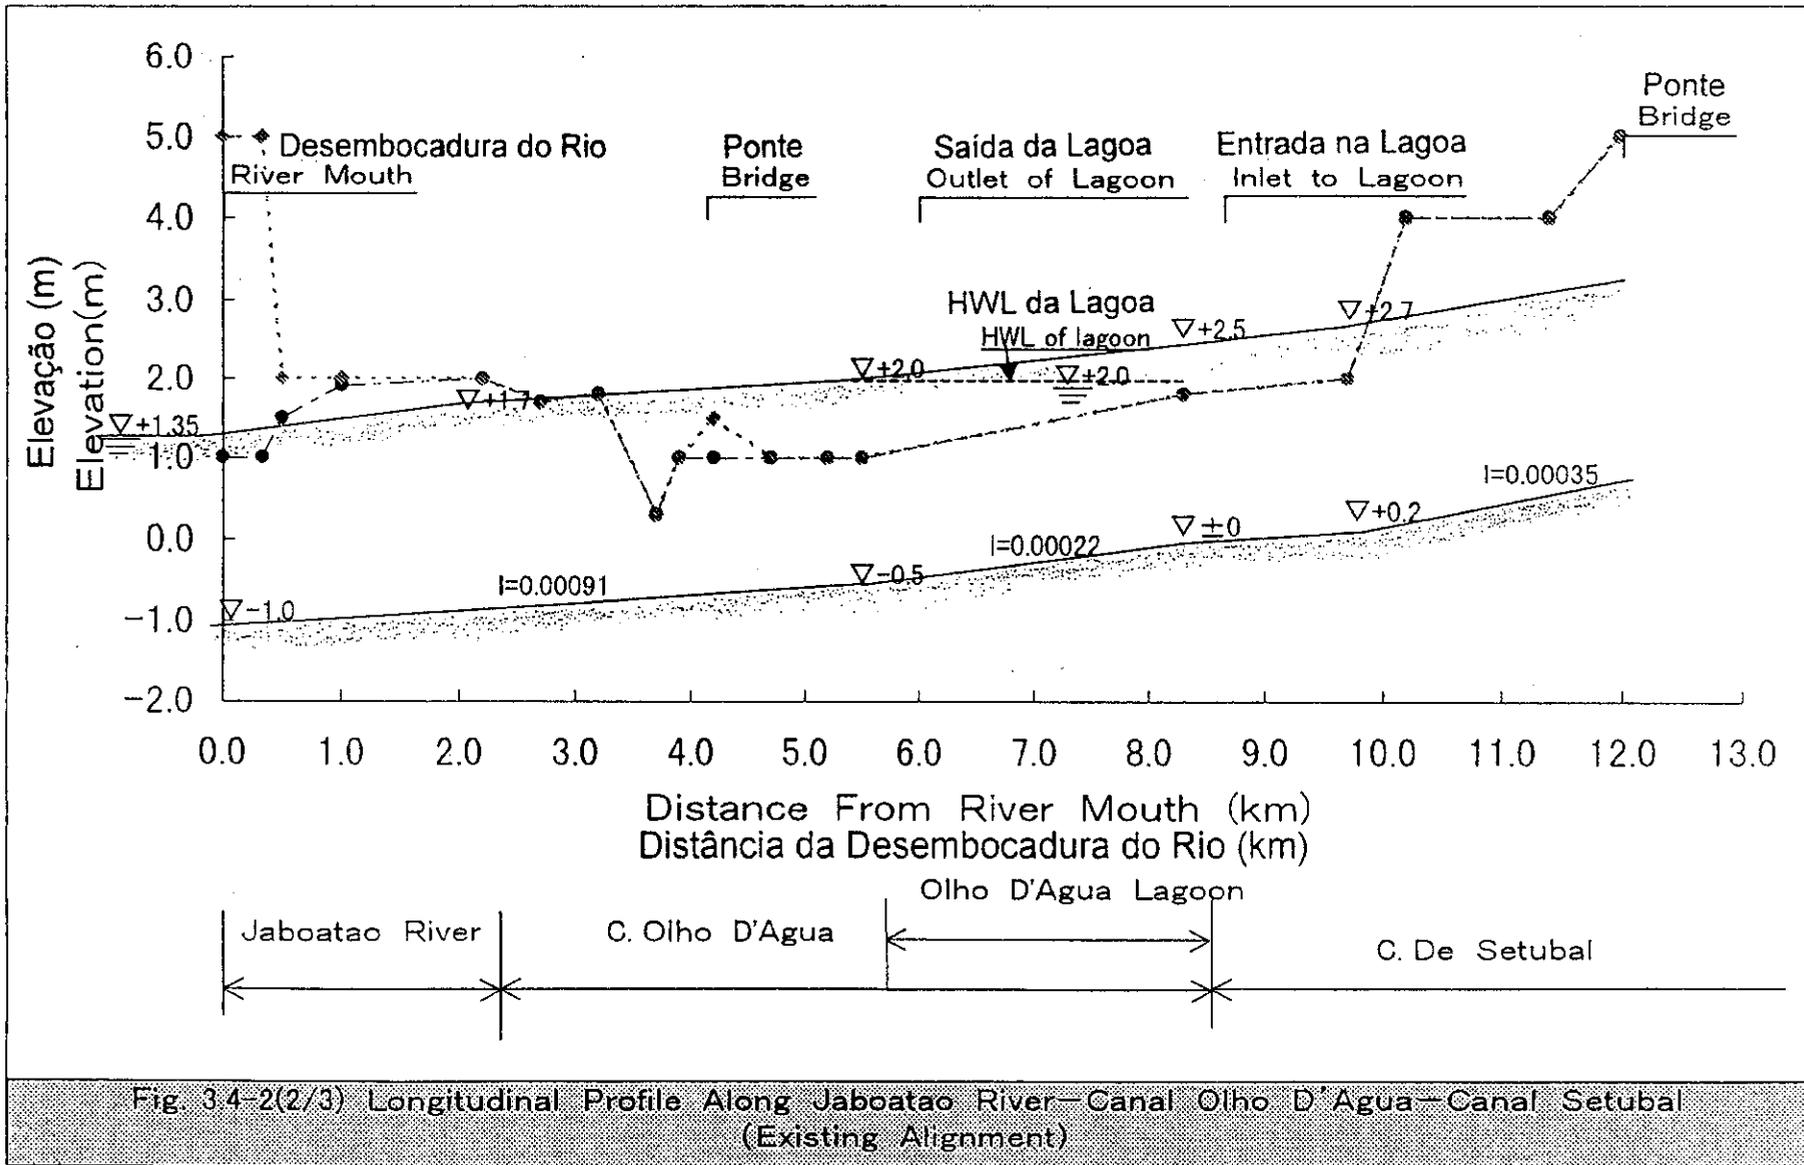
(2/3) Longitudinal Profile Along Jaboatão River—Canal Olho D'Água—Canal Setúbal (Existing Alignment)
